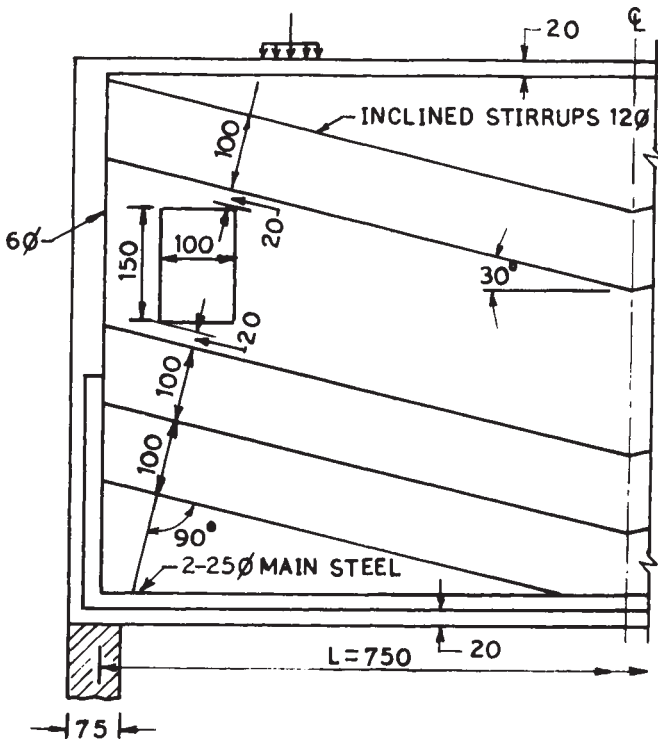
Details of beam with web openings (Kong *et al.*, 1975) and provided with inclined web reinforcement (Ray, 1980; 1983). Beam thickness=200; all dimension in mm.
